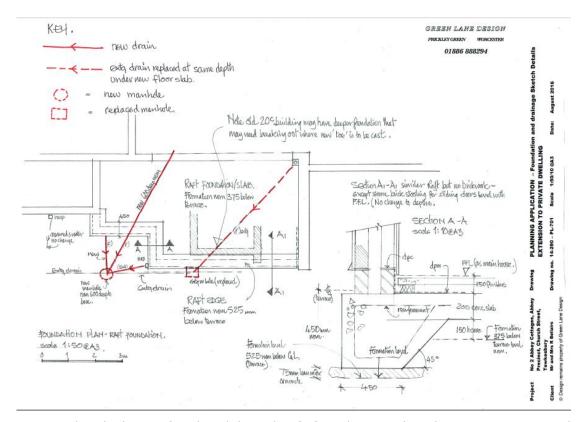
; sketch design for the slab and raft foundation, also showing existing and proposed drainage
